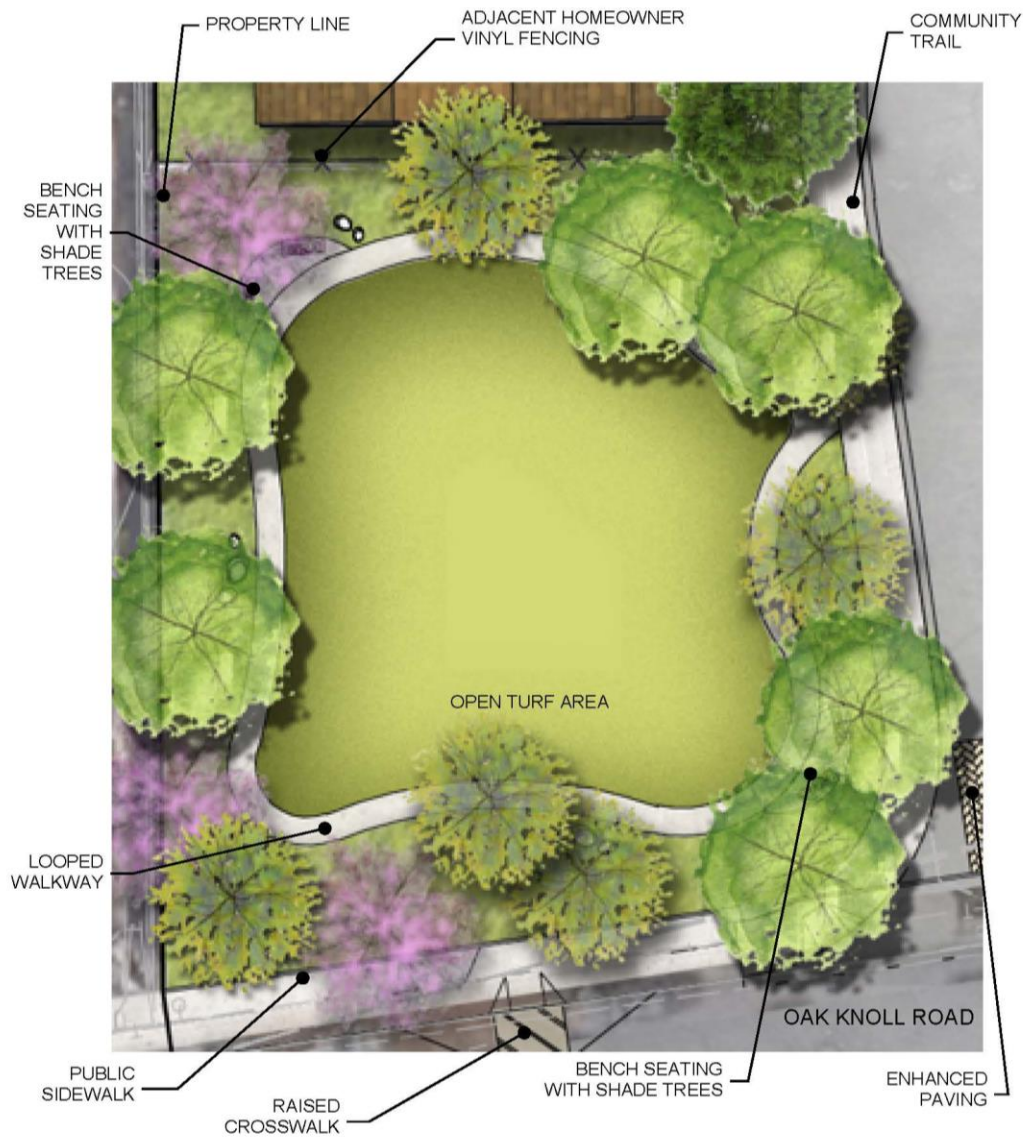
Entry Open Space Area (OSR-2) Conceptual Plan
